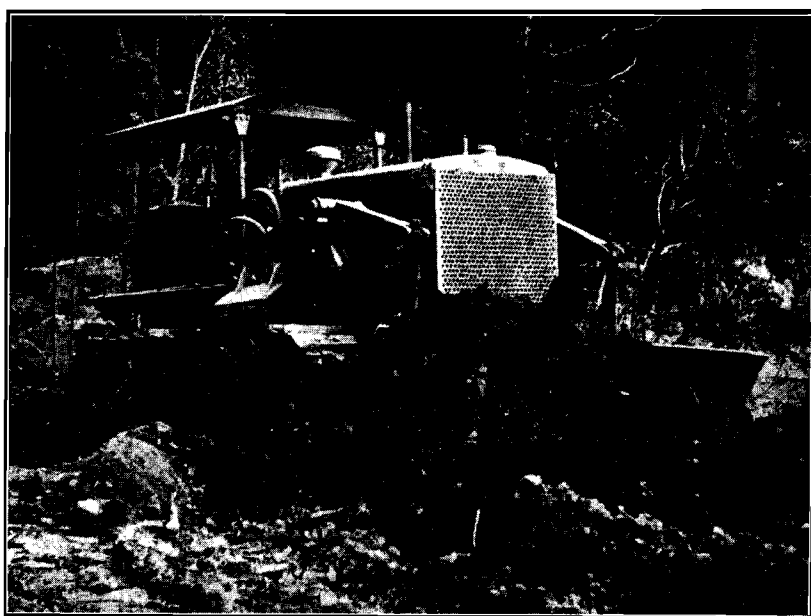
Showing trail builder at work on the Keiwa Road.
